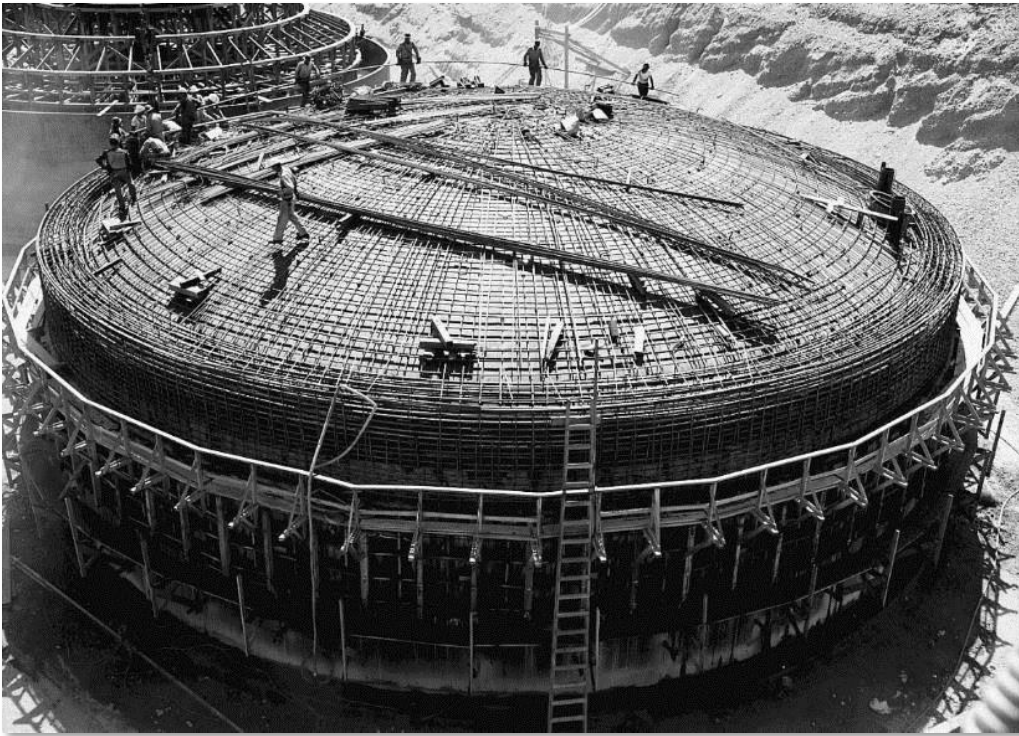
Placement of Dome Reinforcing Steel after Wall Concrete has been Poured (RPP-PLAN-61510)
